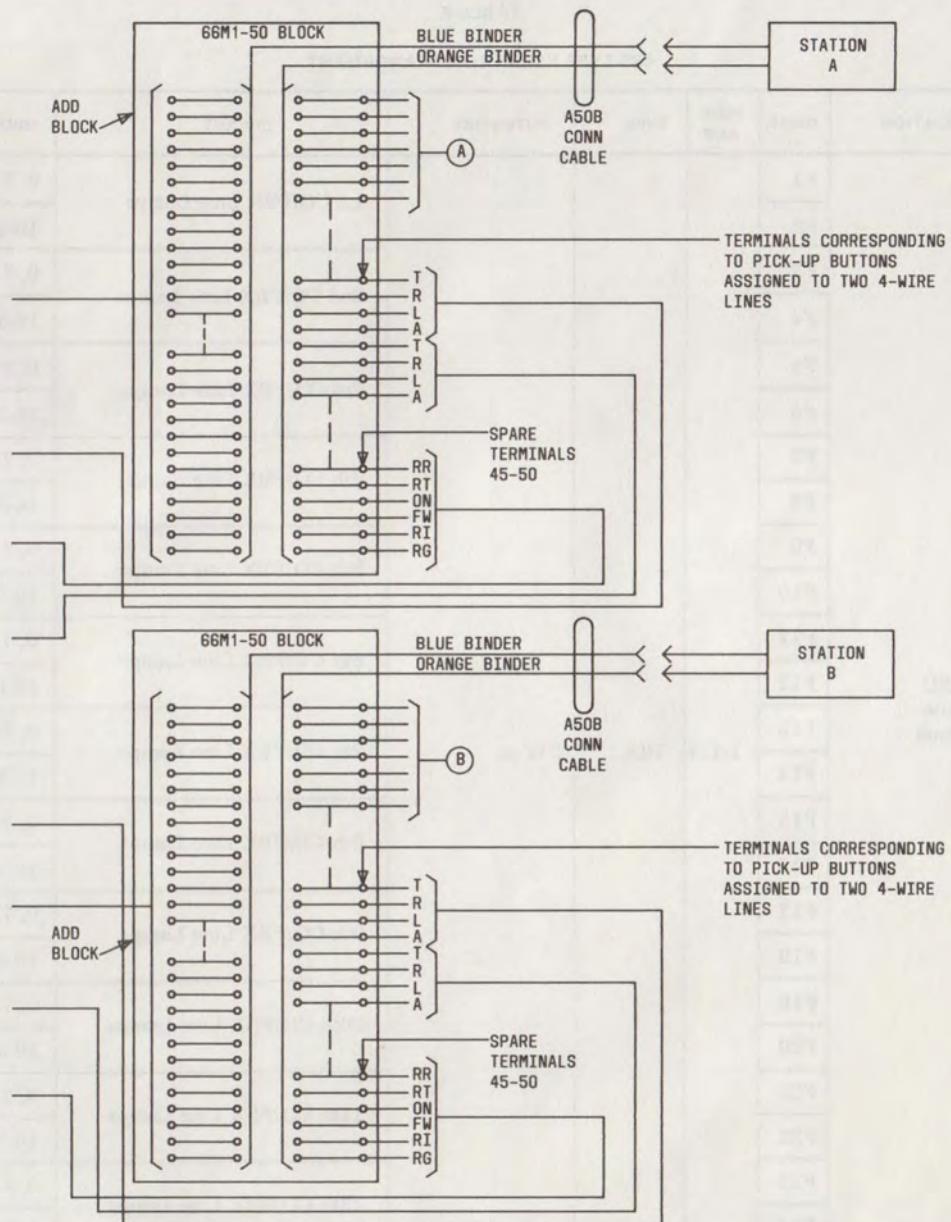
Typical Installation Arrangement for 4-Wire Service (Sheet 2 of 2)
